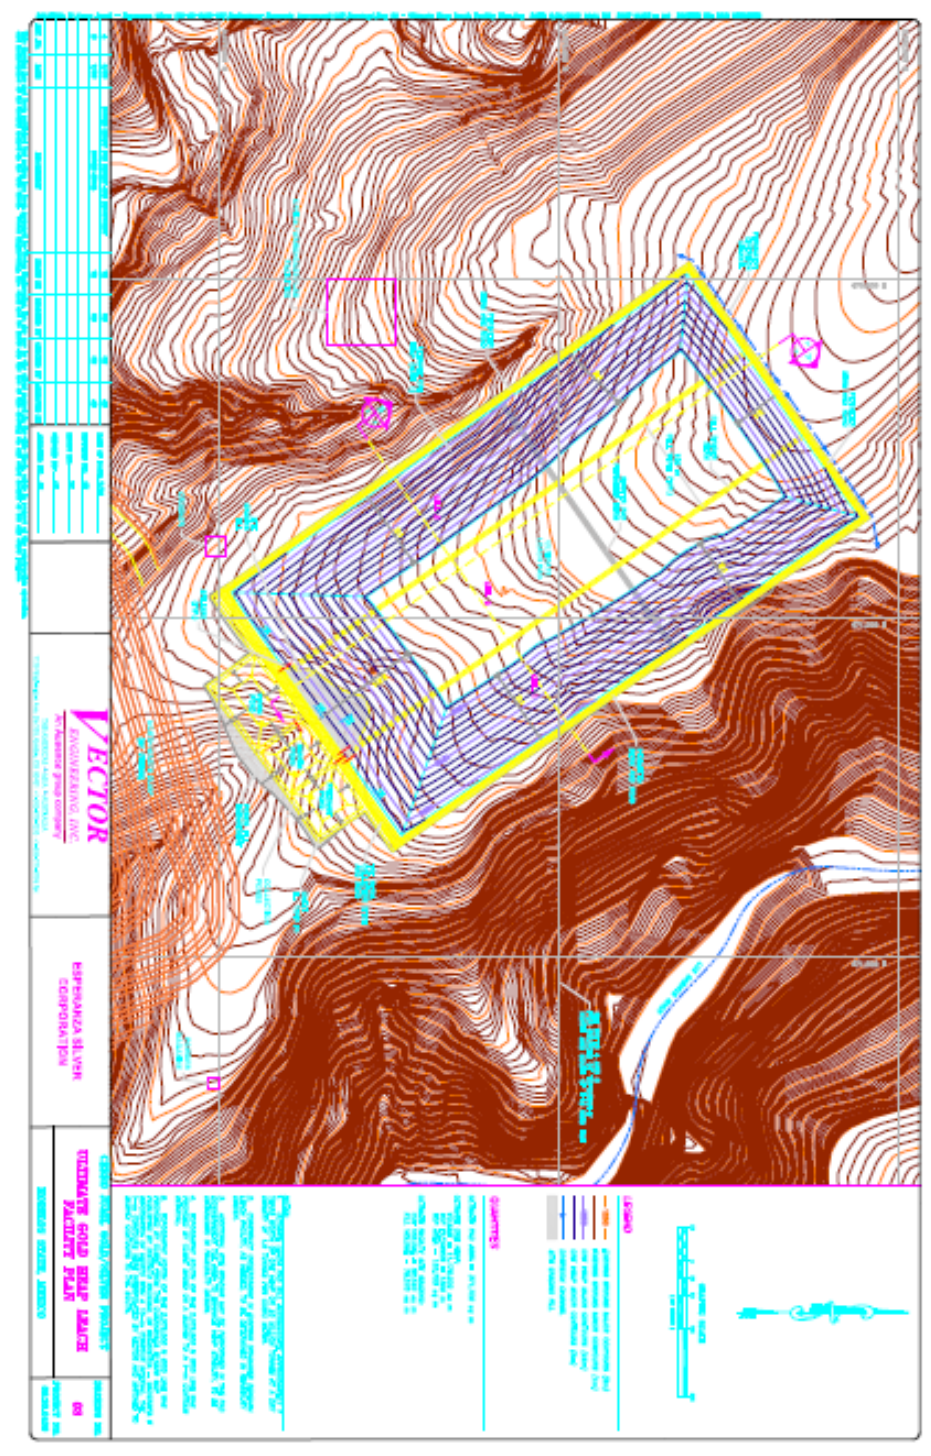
Ultimate Heap Leach Facility Plan
